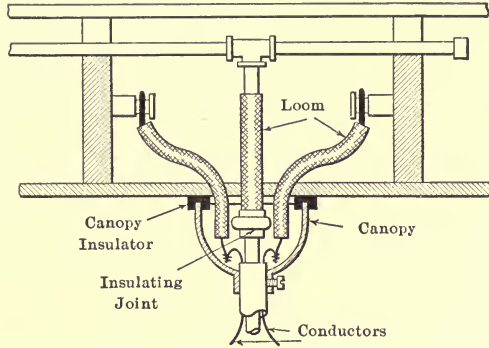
INSULATING JOINT FOR A COMBINATION FIXTURE.
